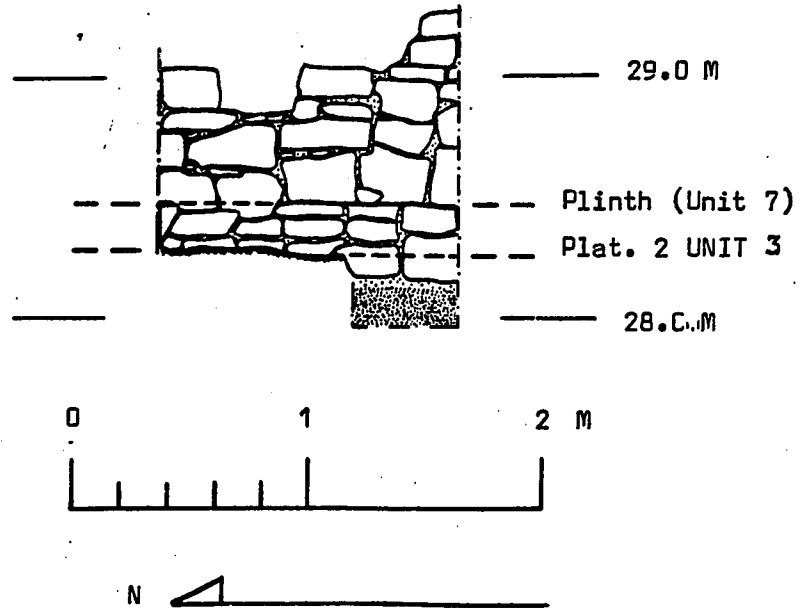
Structure 9: Detailed Elevation - Excavation P1C.
